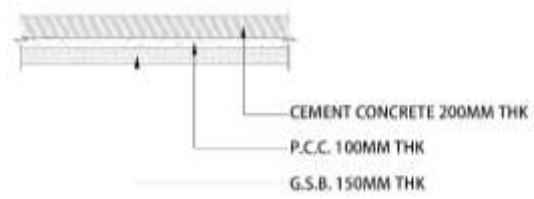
TYPICAL SECTION FOR CC ROAD CONSTRUCTION
